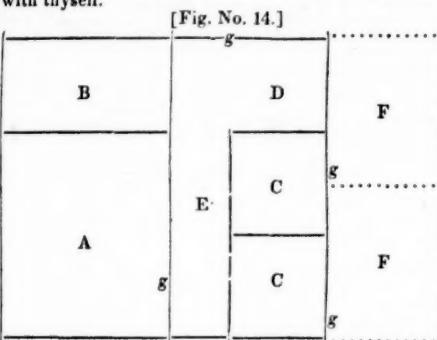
, is the ground plan of the building, which is erected on a side hill. A, is a cellar 14 by 16 feet. B, a space between the cellar wall and the north foundation of the building, filled with earth. C, C, hog-pens, 8 feet square. D, a room for boiling food for hogs, and communicating with the cellar by the alley E. g, doors. F, F, yards.
